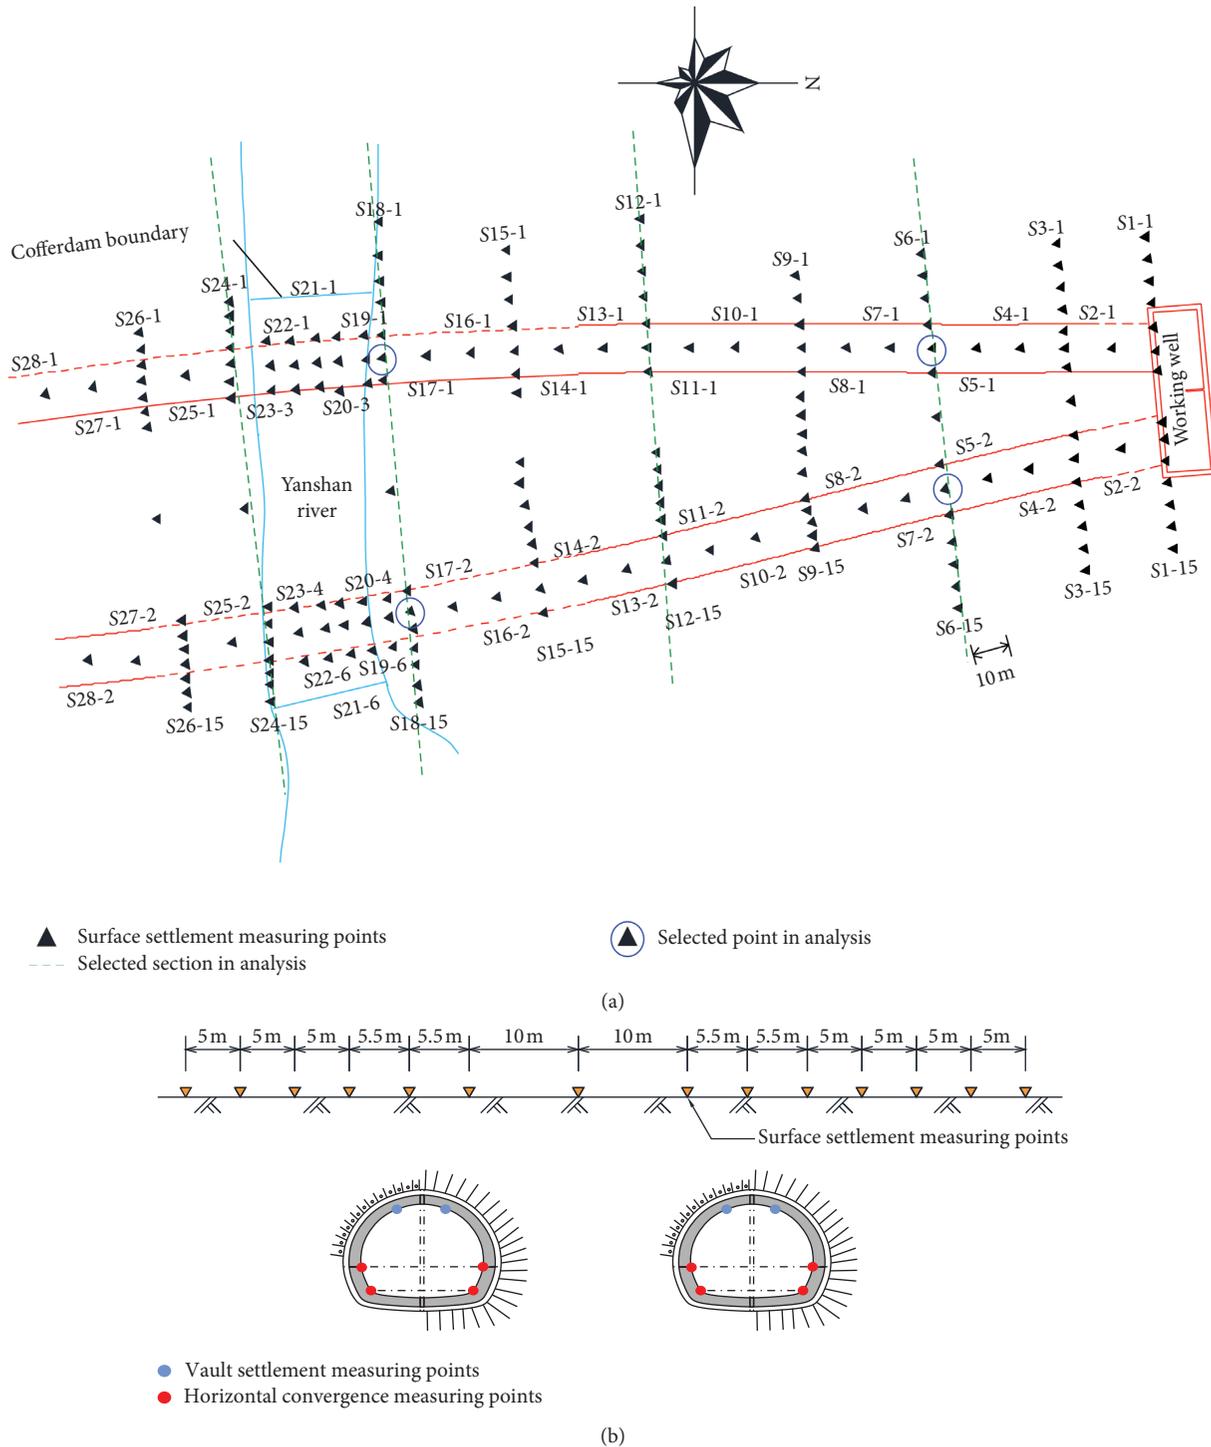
Arrangement of monitoring points. (a) Layout of monitoring points. (b) Typical cross section (S6) measuring points' arrangement.
